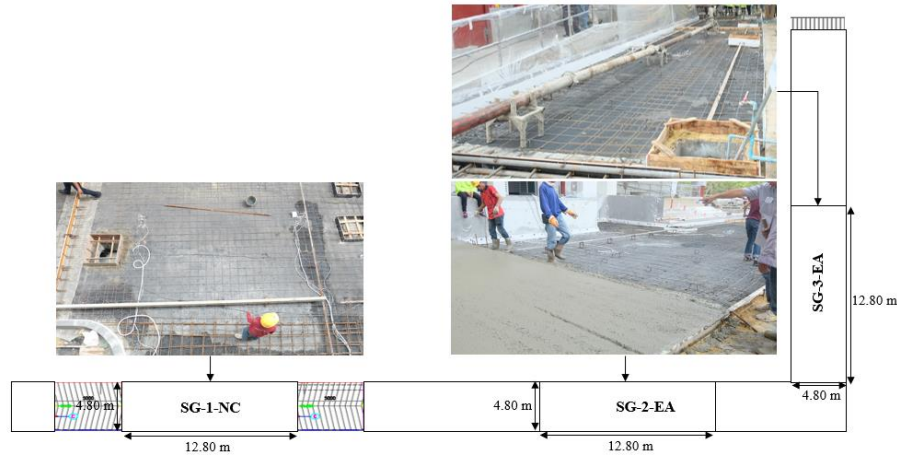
Plan view and site conditions of the investigated slabs on grade 1 at construction site 1
